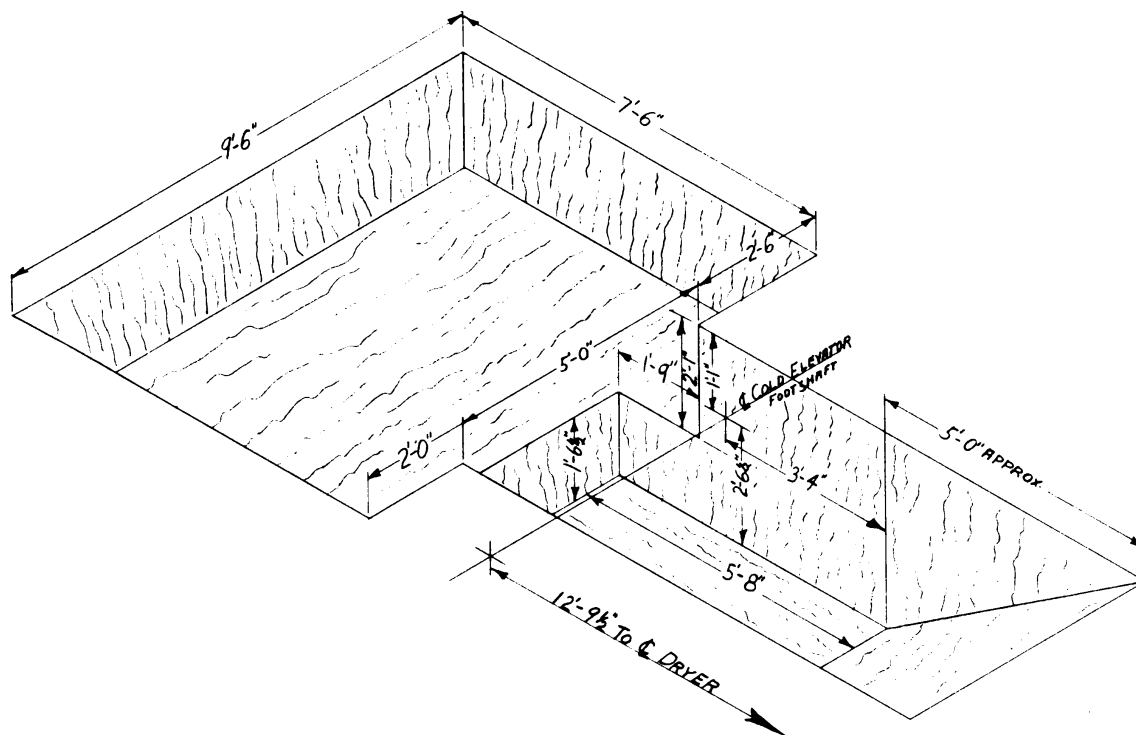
A - DIAGRAM WITH DIMENSIONS FOR USE IN DIGGING PIT FOR RECIPROCATING FEEDER AND COLD ELEVATOR. (This diagram to be used in conjunction with drawing Fig. 4 Asphalt Plant Erection and Operation Book.)
